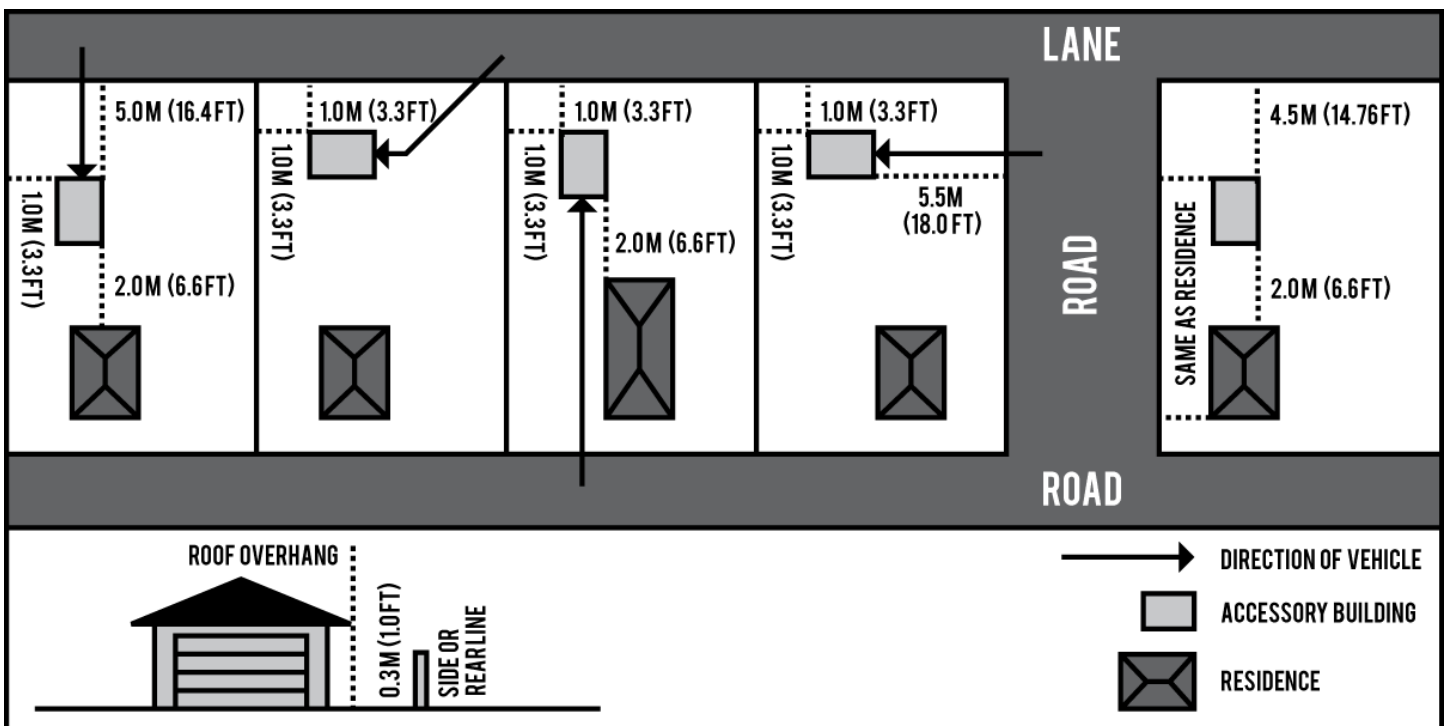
SITING OF ACCESSORY BUILDINGS
